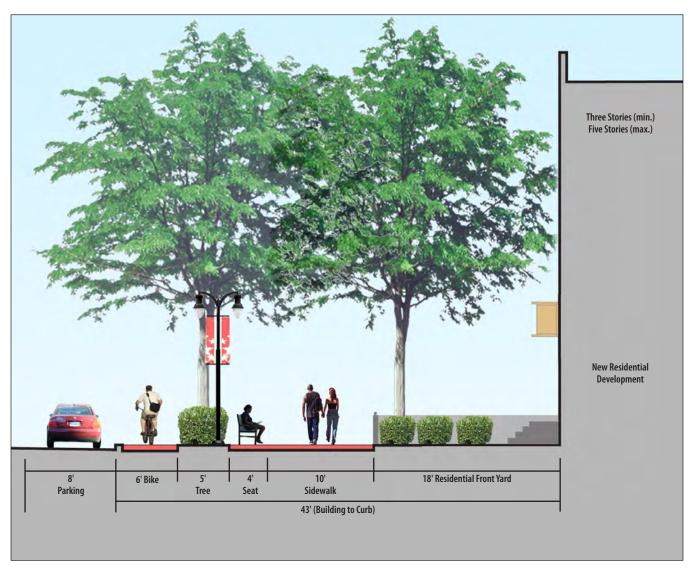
PROPOSED STREET SECTION AT RHODE ISLAND AVENUE ADJACENT TO NEW INFILL RESIDENTIAL, LOOKING WEST.
